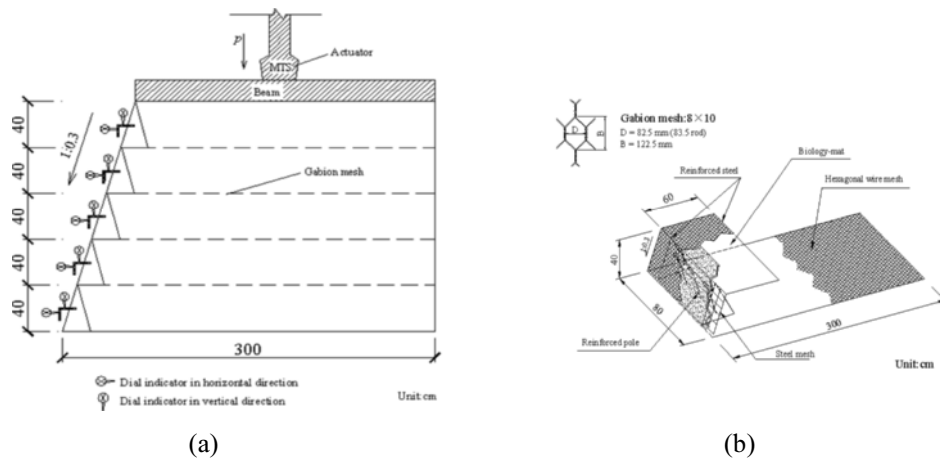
(a) Green reinforced gabion retaining wall; (b) Green reinforced gabion component
